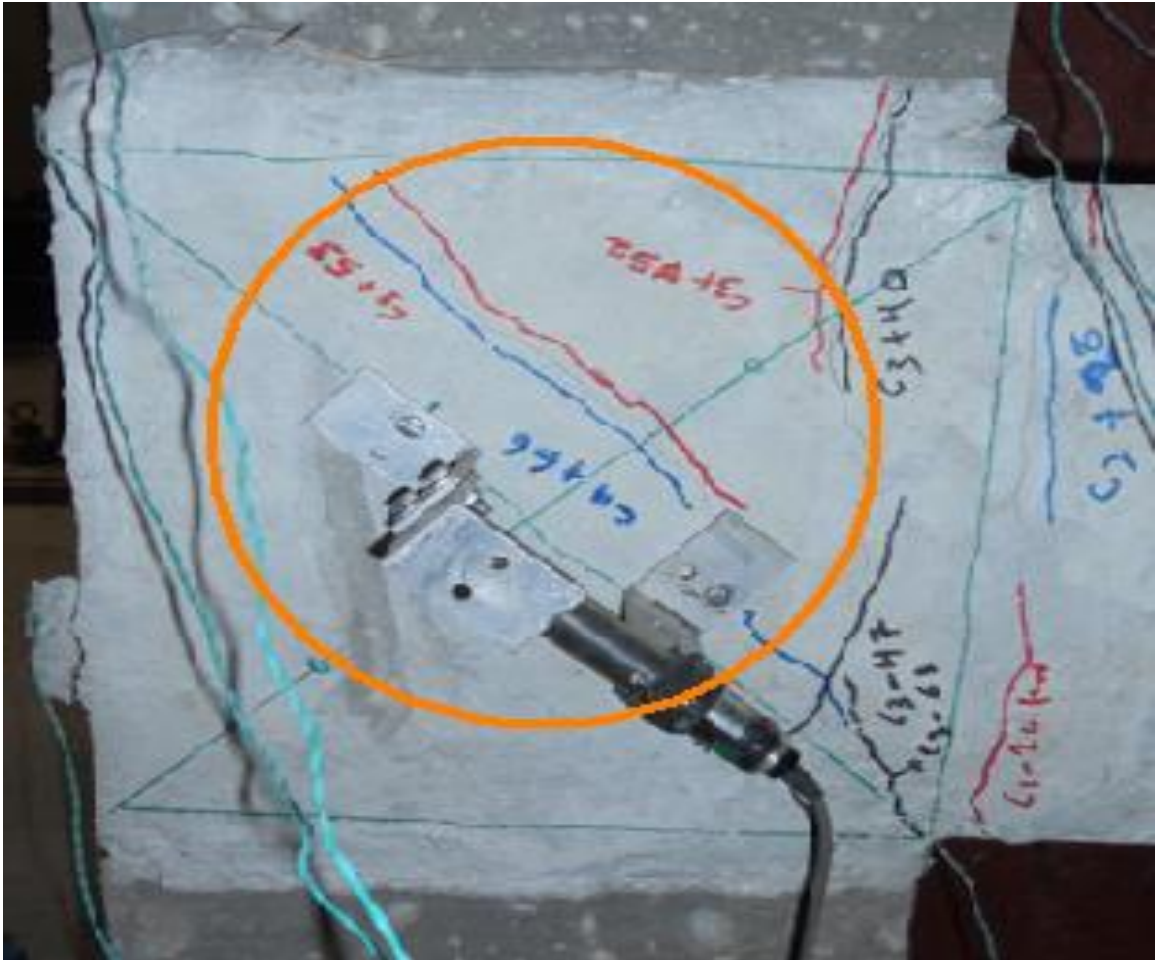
First diagonal crack in joint for specimen BCJ-12MM-Bent In
